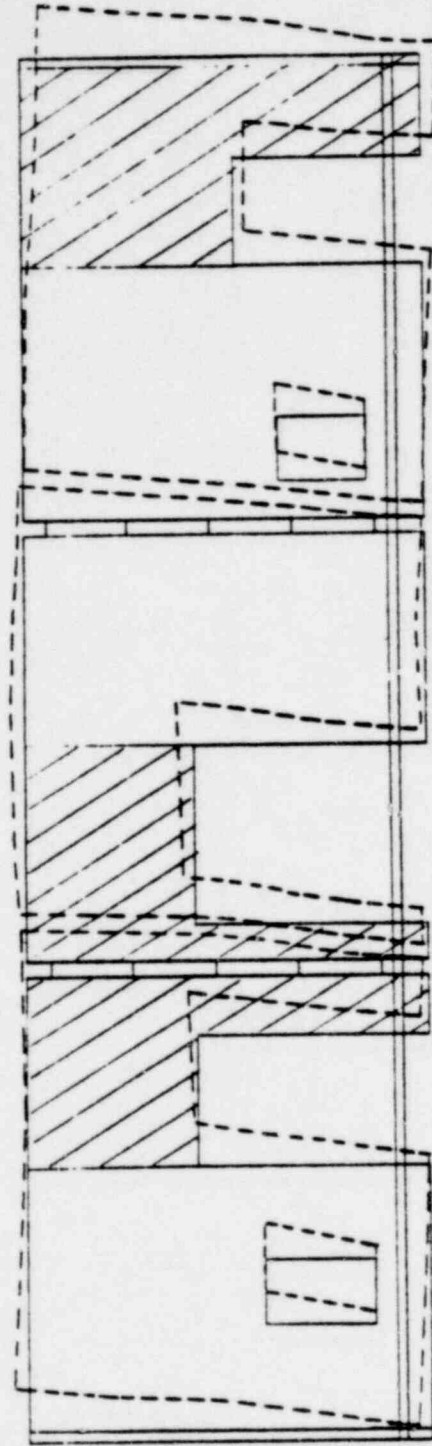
DEFLECTED SHAPE OF SOUTH WALL
